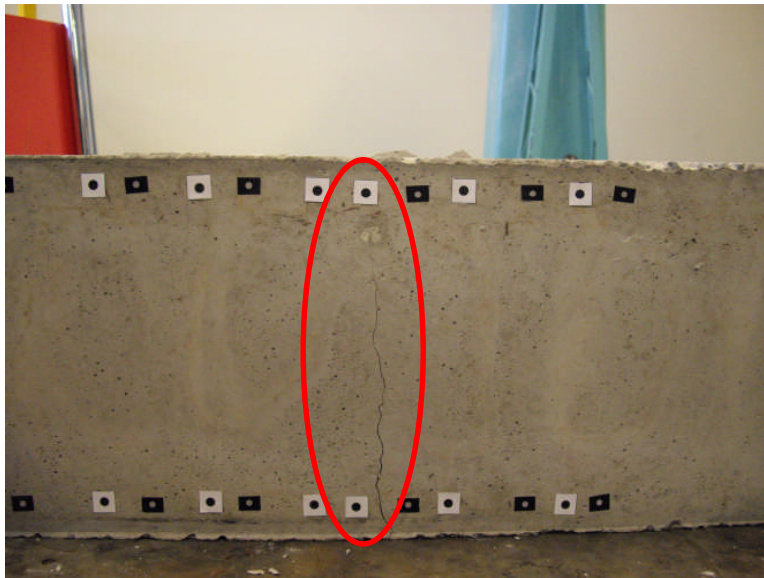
The concrete beam after stress was applied. The circle shows the crack that was created during experimentation.
